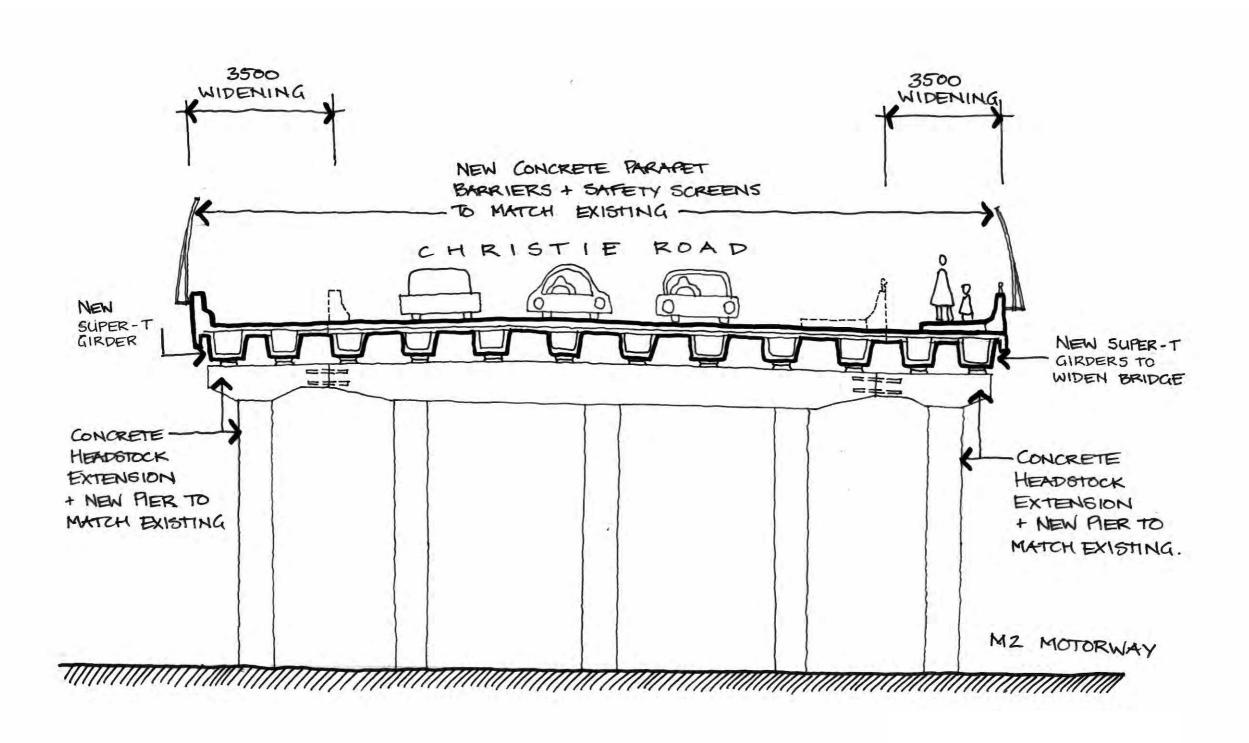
Bridge 5.1 Christie Road Bridge - Cross Section
